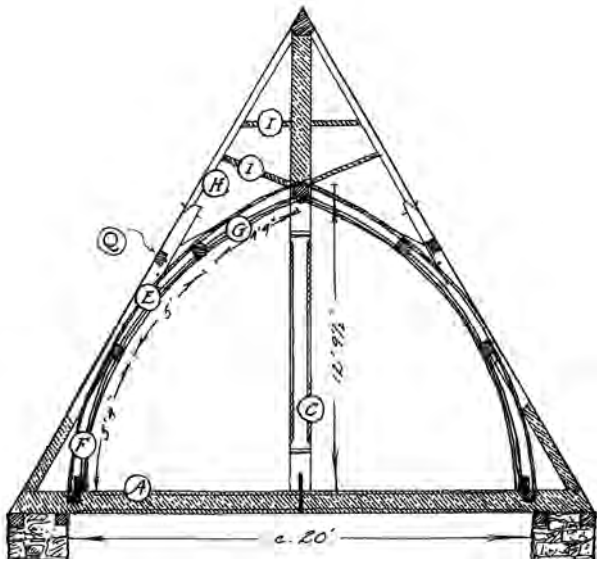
Conjectural transverse section at kingpost truss, Tremblay.
